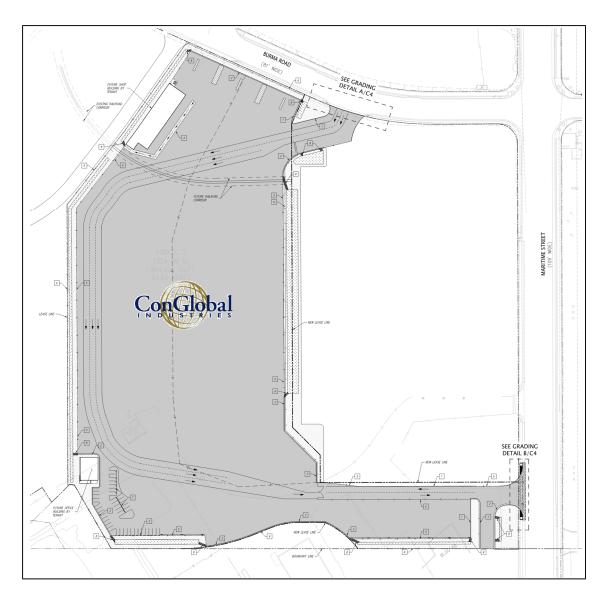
Site Plan - ConGlobal Facility at 11 Burma Road
